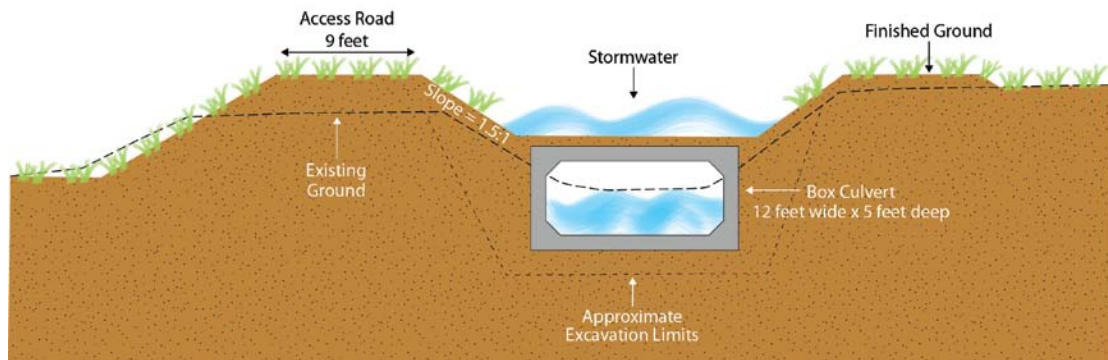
Typical Cross-Section B: 12-foot-wide by 5-foot-deep box culvert at about 1200 North in Logan (looking downstream)
